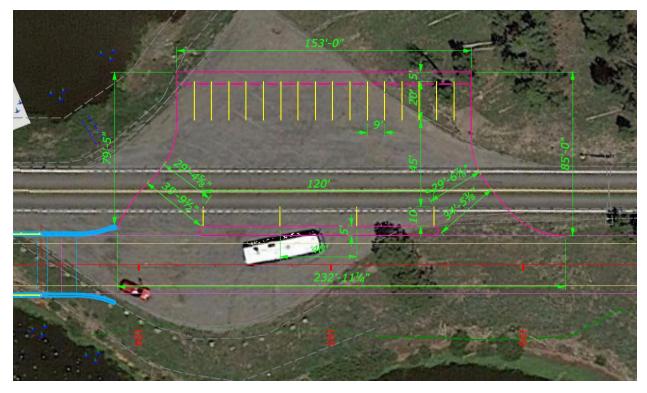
Turnout at East End of Proposed Viaduct on North Side of Road
